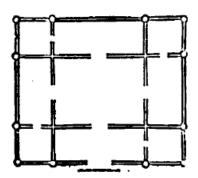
Bungalow plan with partitioned corners (King, 1984)
